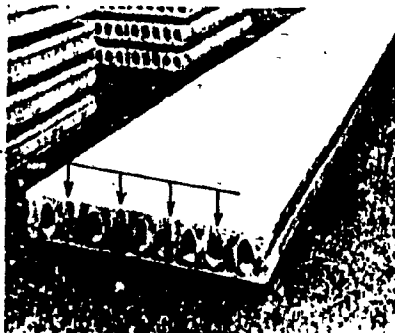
Cantilever End of Hollow-Core Slab is Reinforced with Mild Steel Bars concreted into four cores.
